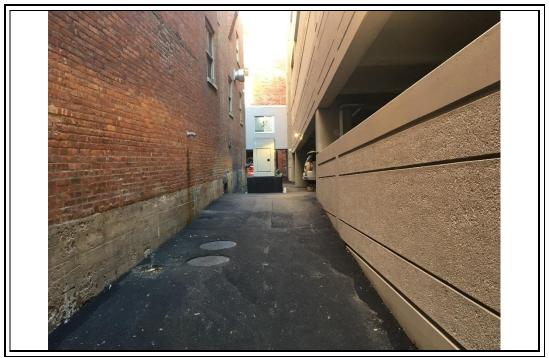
Looking northeast; asphalt cover between 144 State Street and parking garage.
